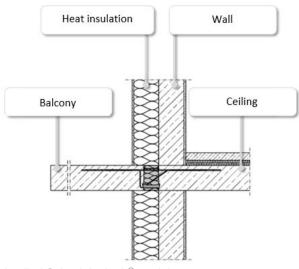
Schöck Isokorb[®] Type KXT: Heat and sound insulation for cantilevered concrete balconies
